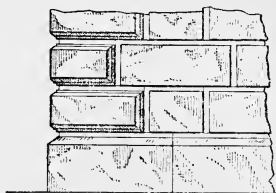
Ashlar Walling with rebated Joints and Moulded Quoins.
